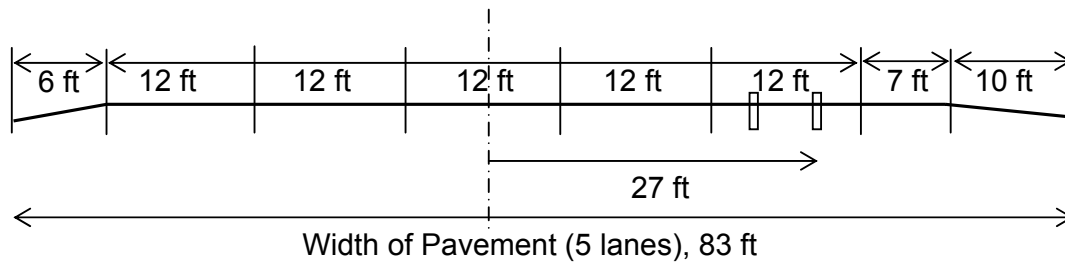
Dimension of Cross Section of the Pavement for Section B, Fort Worth North Loop IH 820.
